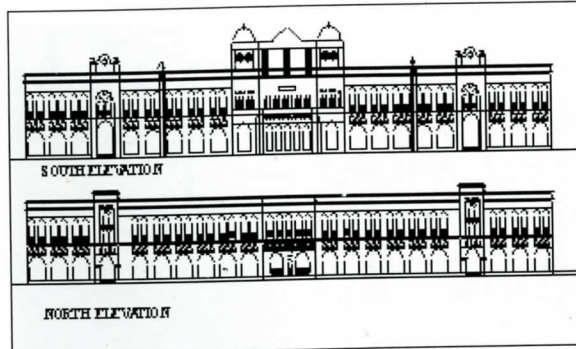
Previous Elevation of Court Building without second floor (reconstructed view)
